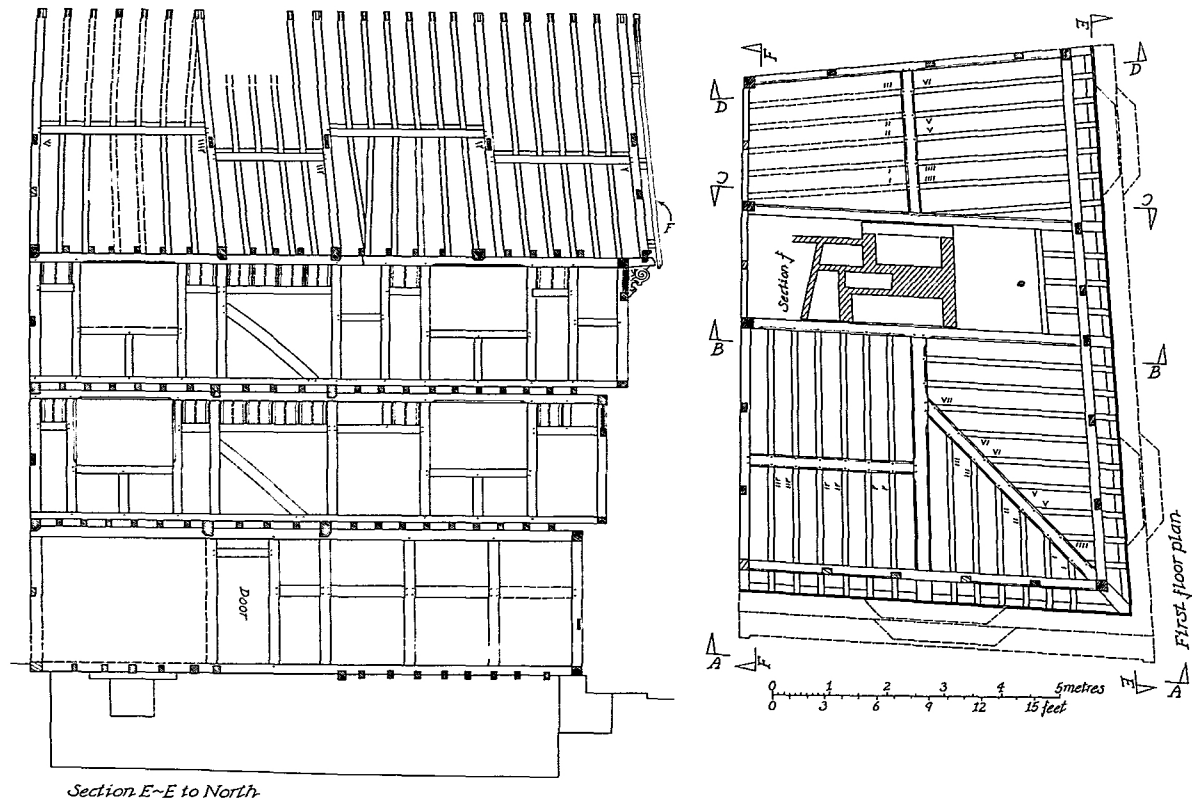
No. 28 Palace Street, Canterbury: First-floor frame and longitudinal section.
